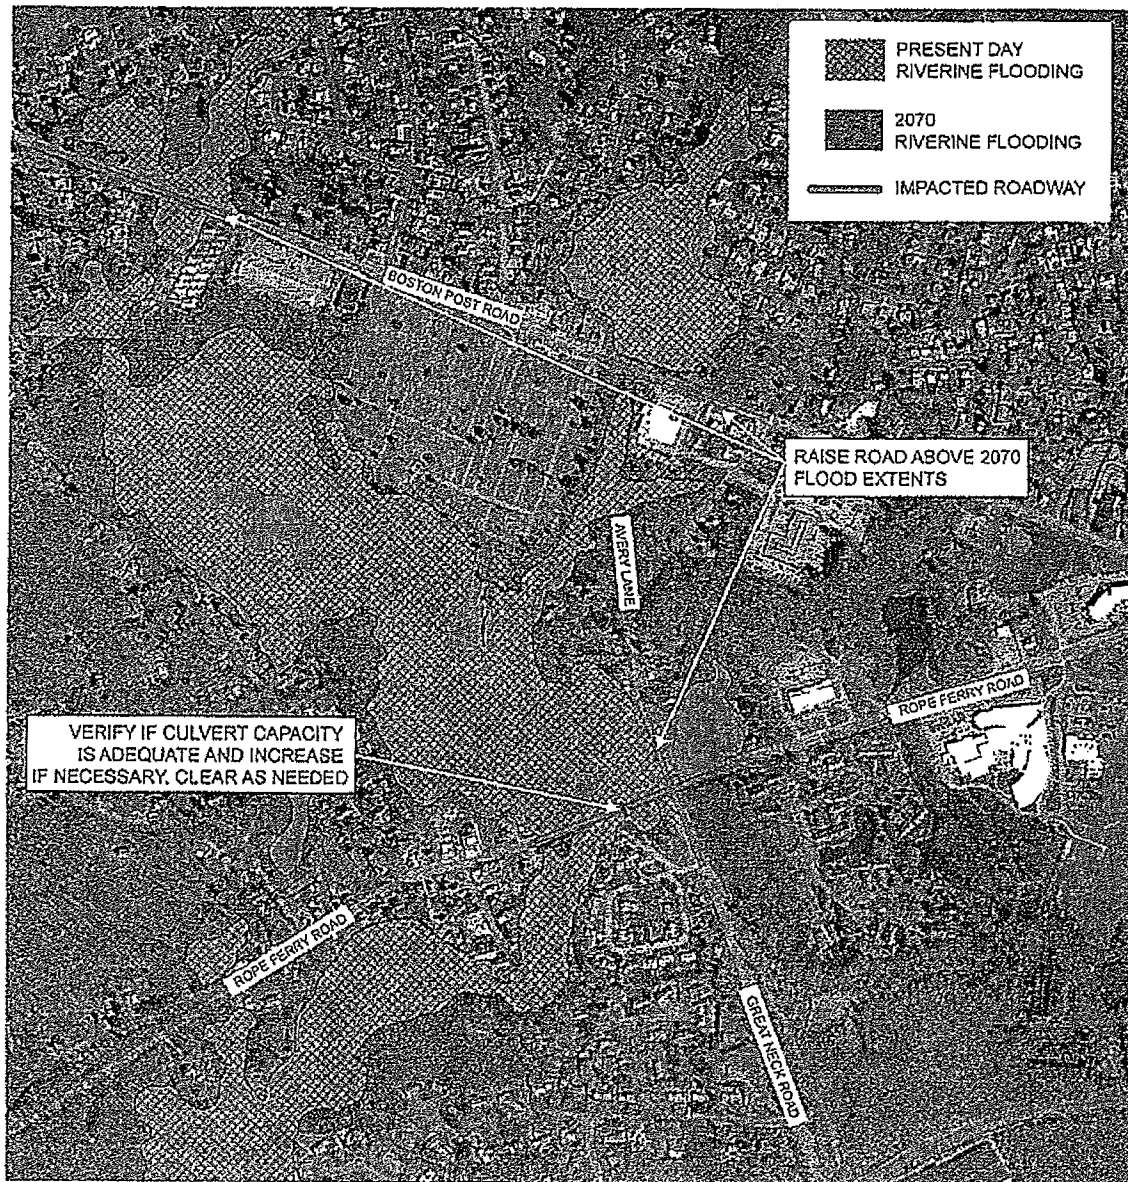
Proposed Conceptual Road Improvements at Rope Ferry/Avery Lane/Great Neck Road – 2070, 100-Year Riverine Flood Scenario Shown
